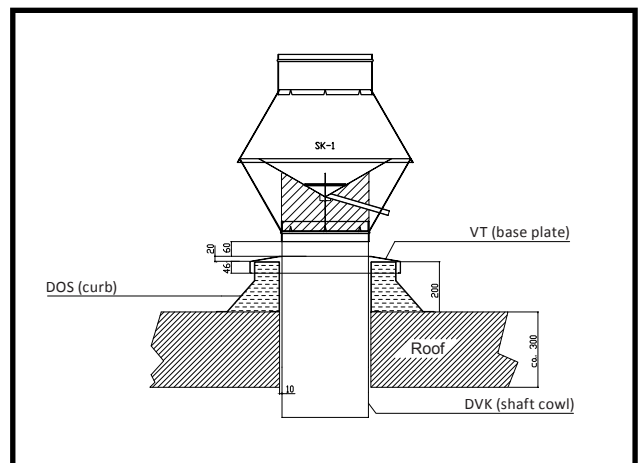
Aluminium roof shaft cowl with demountable U-frame.
